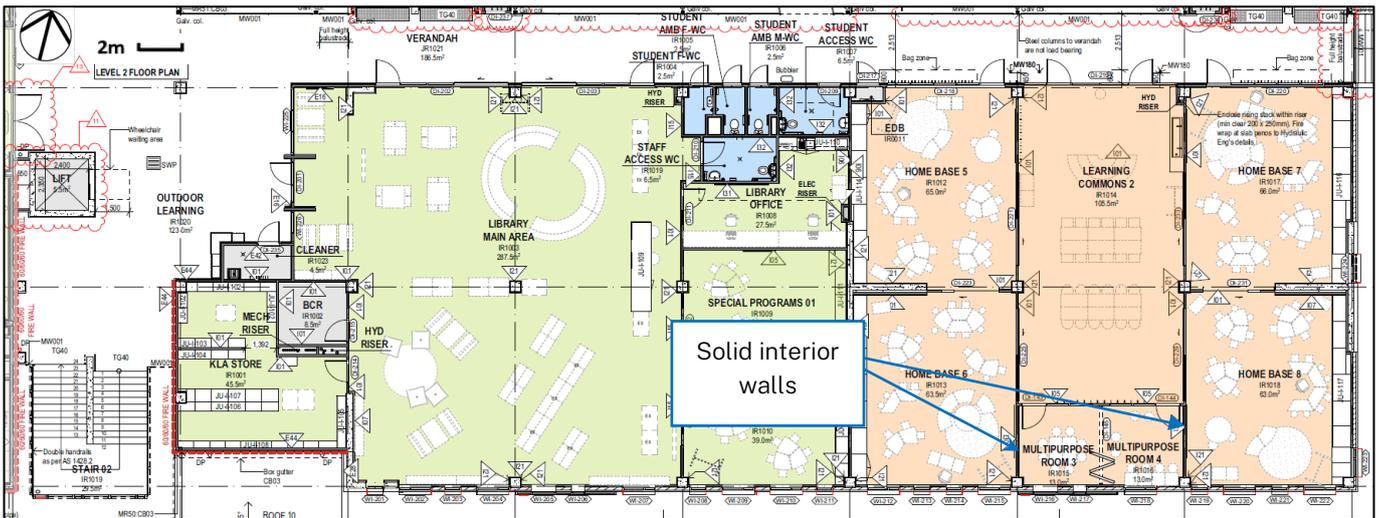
| Approved level 2 floor plan of Building I (Source: Modification 2, 2023)
